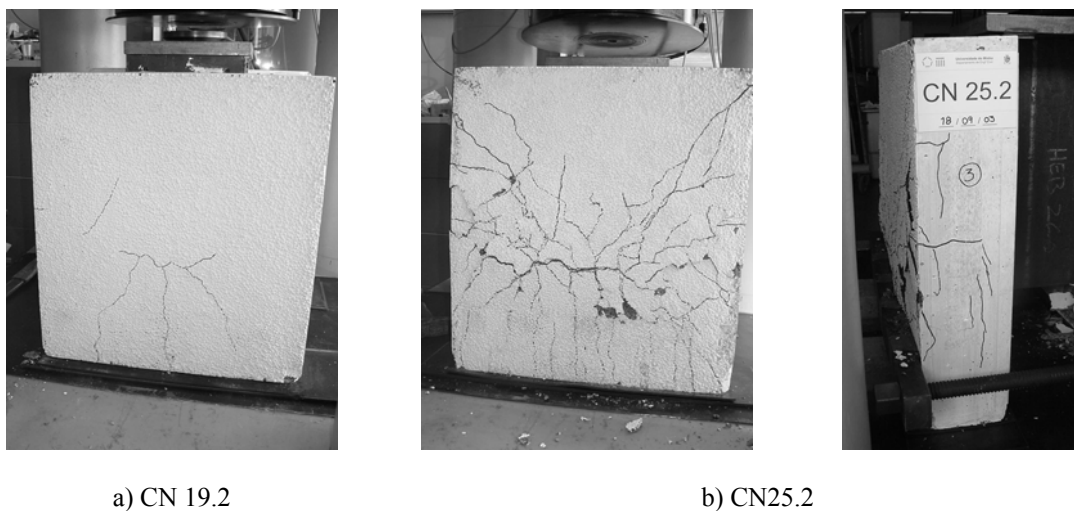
Concrete crack patterns (POST tests)
